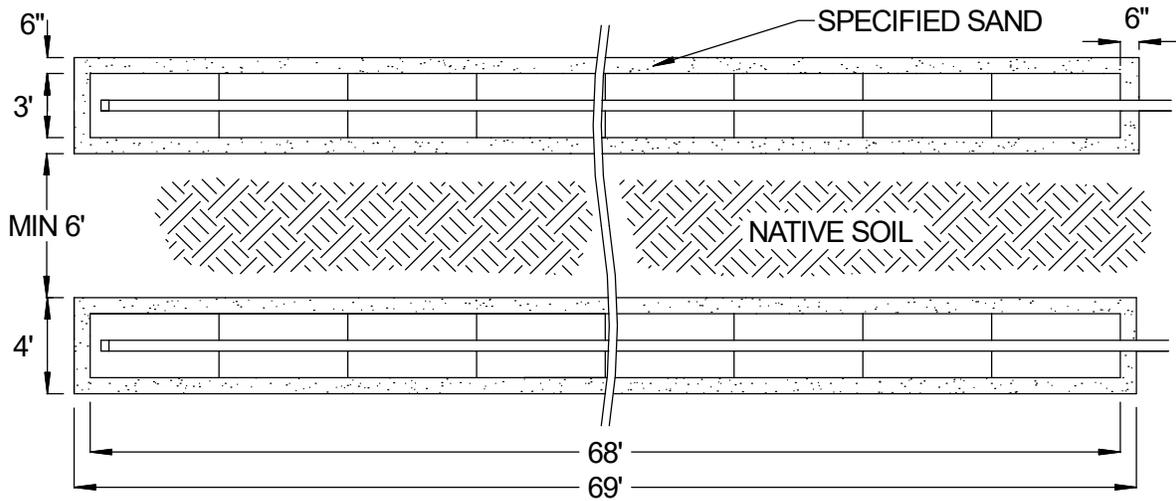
SECTION VIEW – TRENCH SYSTEM – LEVEL SITE
